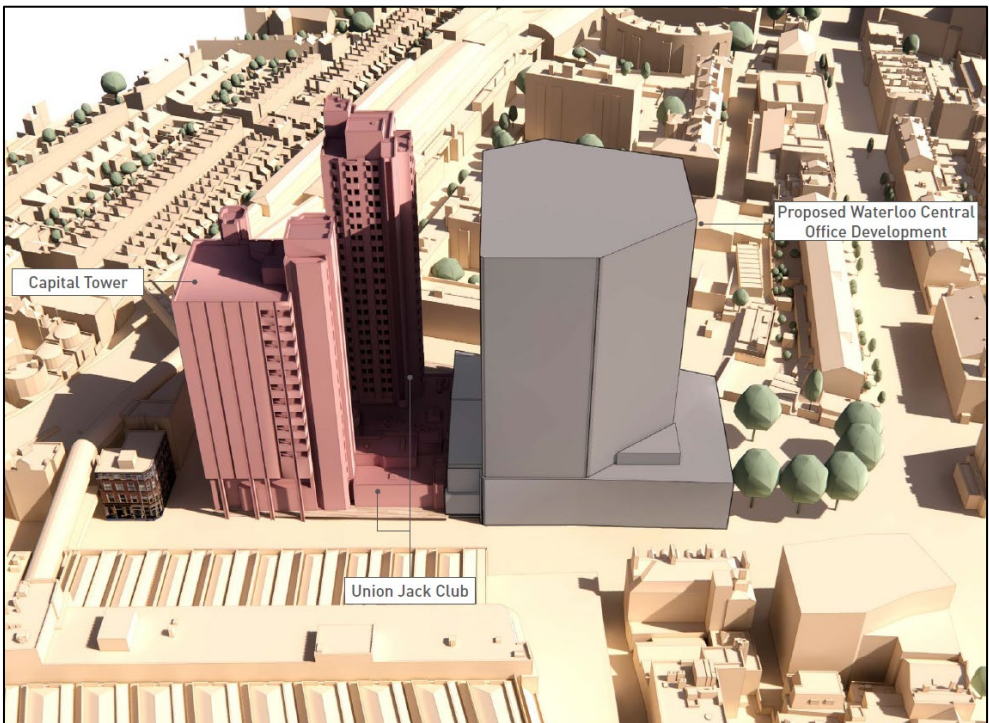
The proposed Waterloo Central Office development on 21<sup>st</sup> December as viewed from Waterloo Road, aerial view
